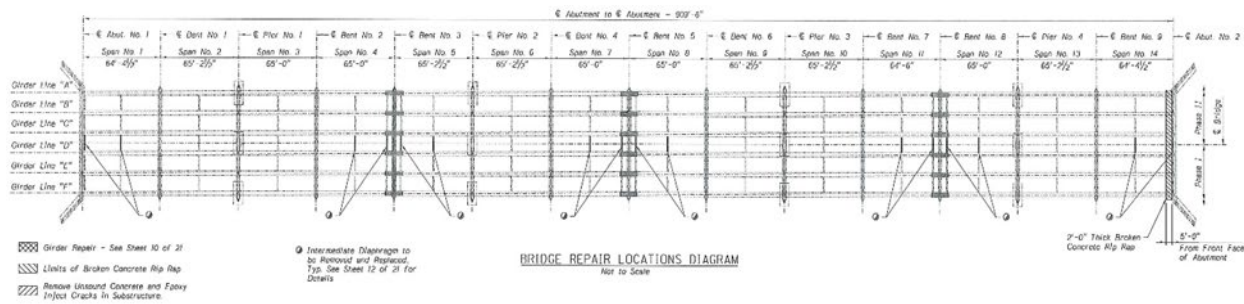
Girder spans and location of repair works, from the repair documents of Platte River Bridge East of Grand Island, courtesy of NDOT
